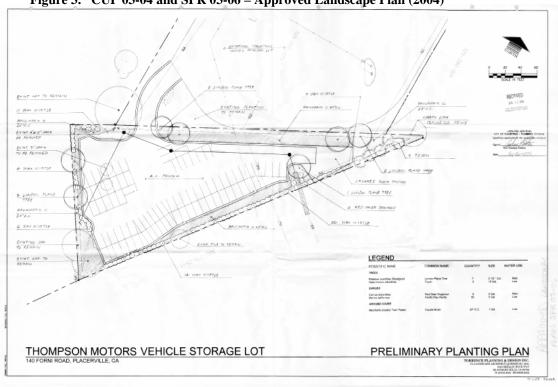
CUP 03-04 and SPR 03-06 – Approved Landscape Plan (2004)
